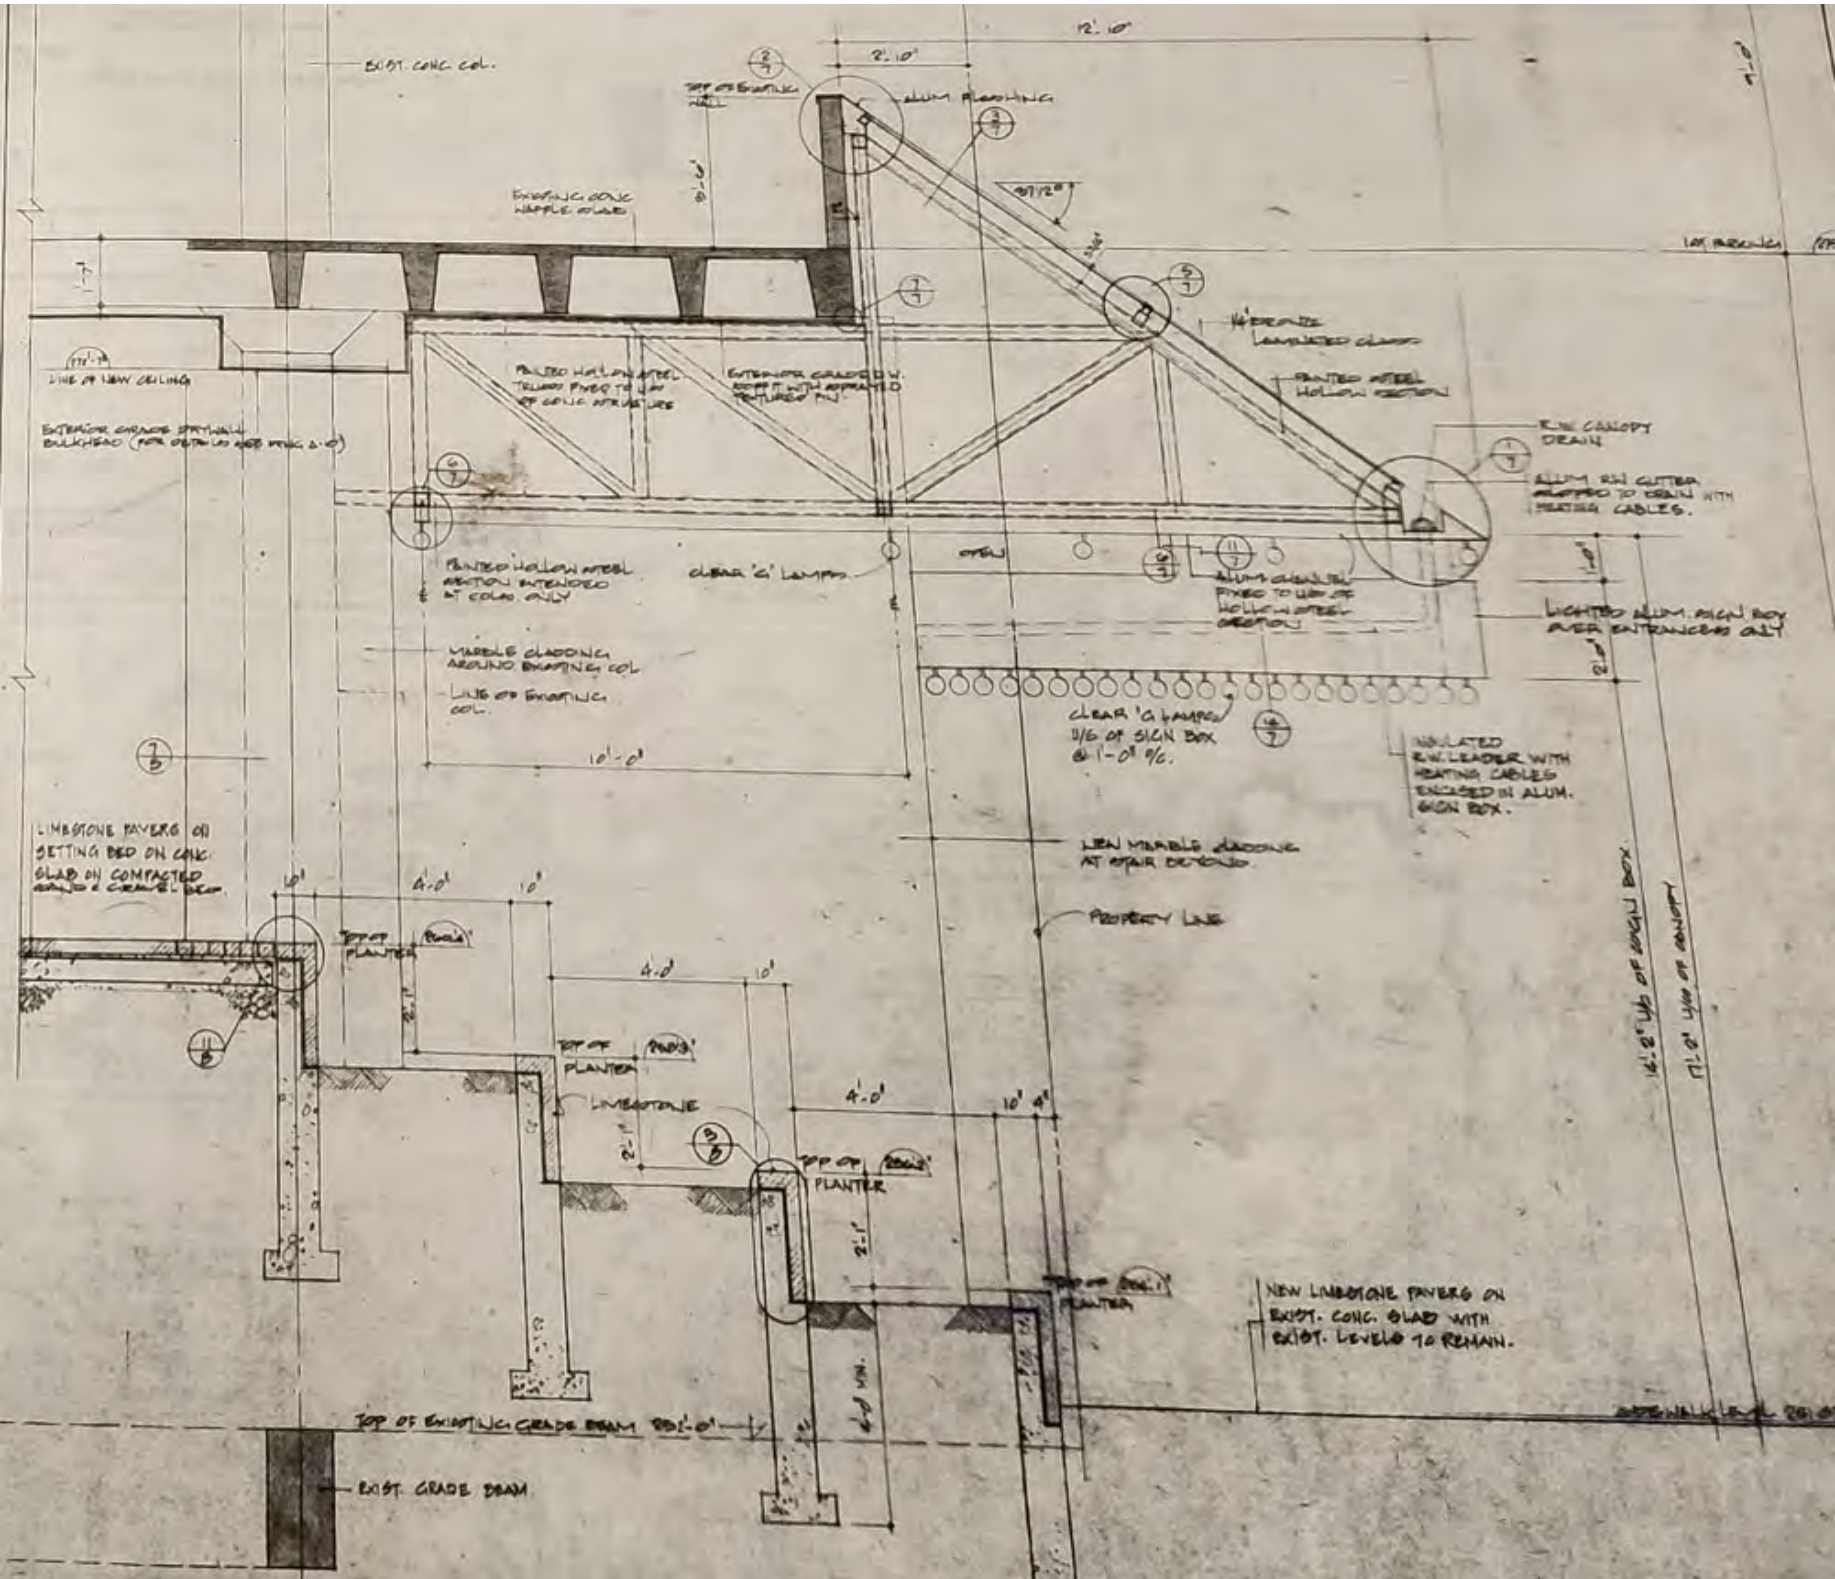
Detail of drawing showing proposed renovations for exterior of north elevation (canopy and planters), c. 1982 (Webb Zerafa Menkes Housden Partnership Architects).
